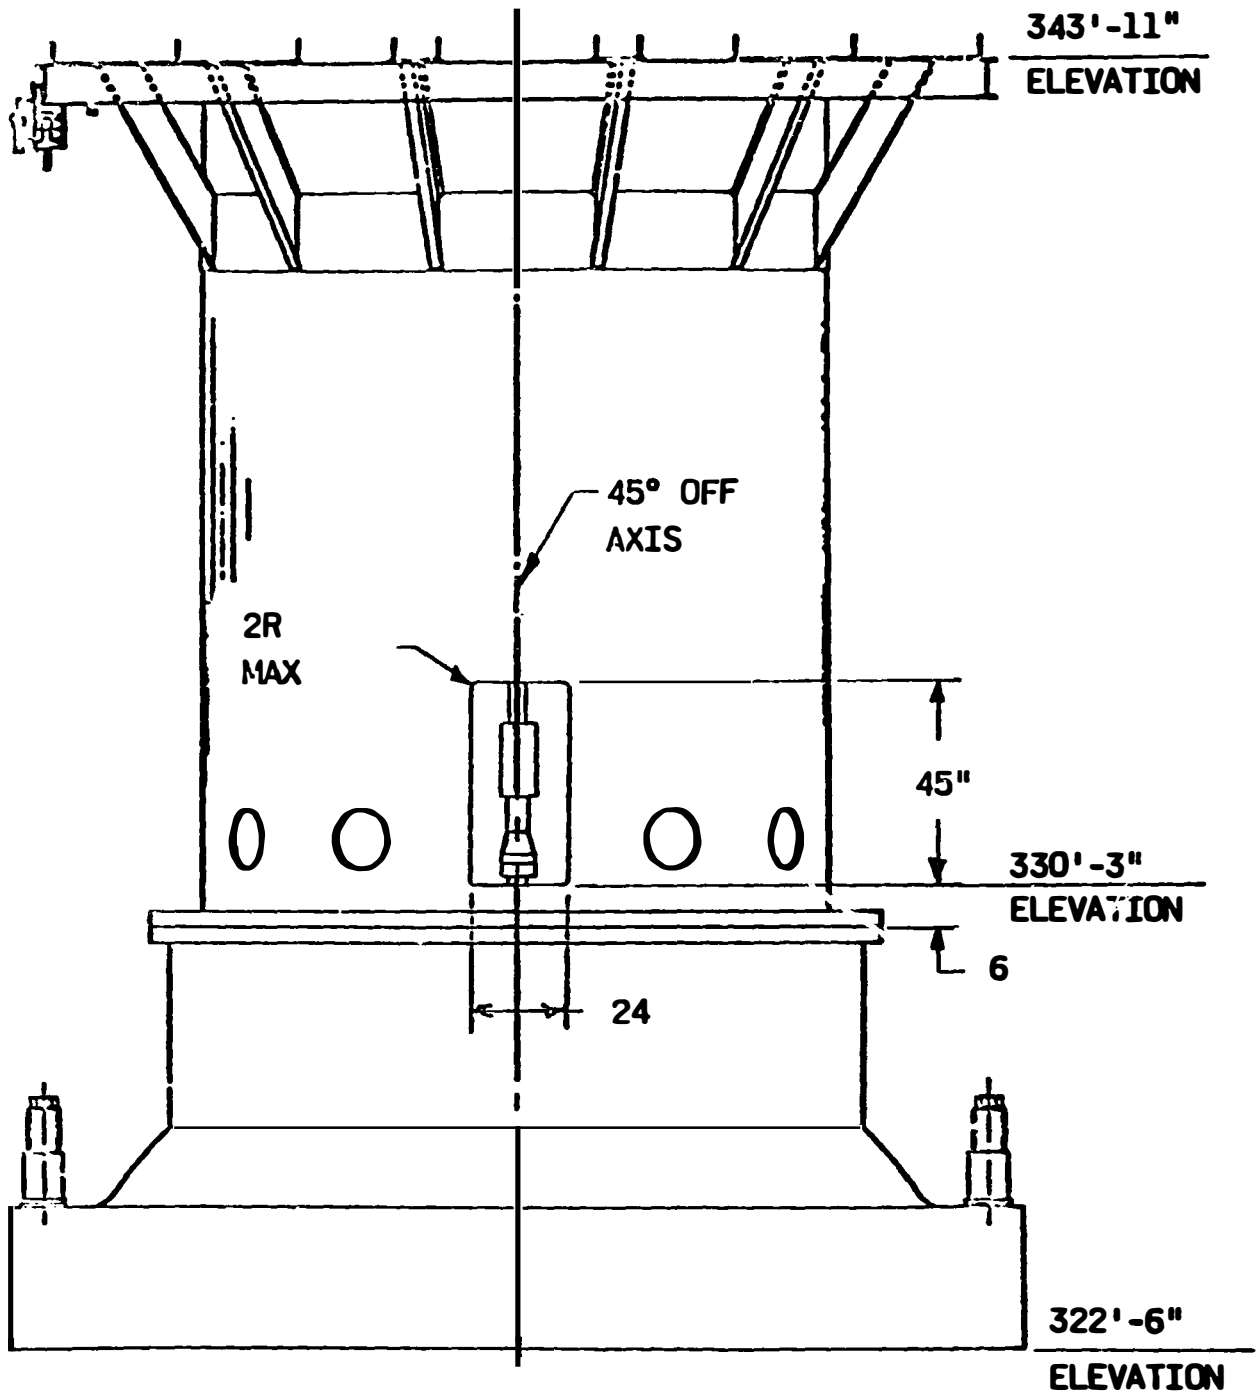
CRDM ACCESS HOLE IN SERVICE
